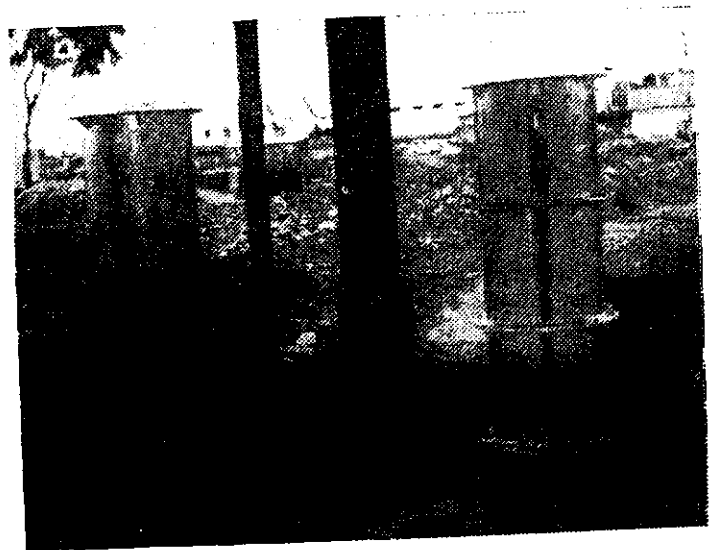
(Chap 14): Twin surge tanks of masonry and steel, looking upstream.
